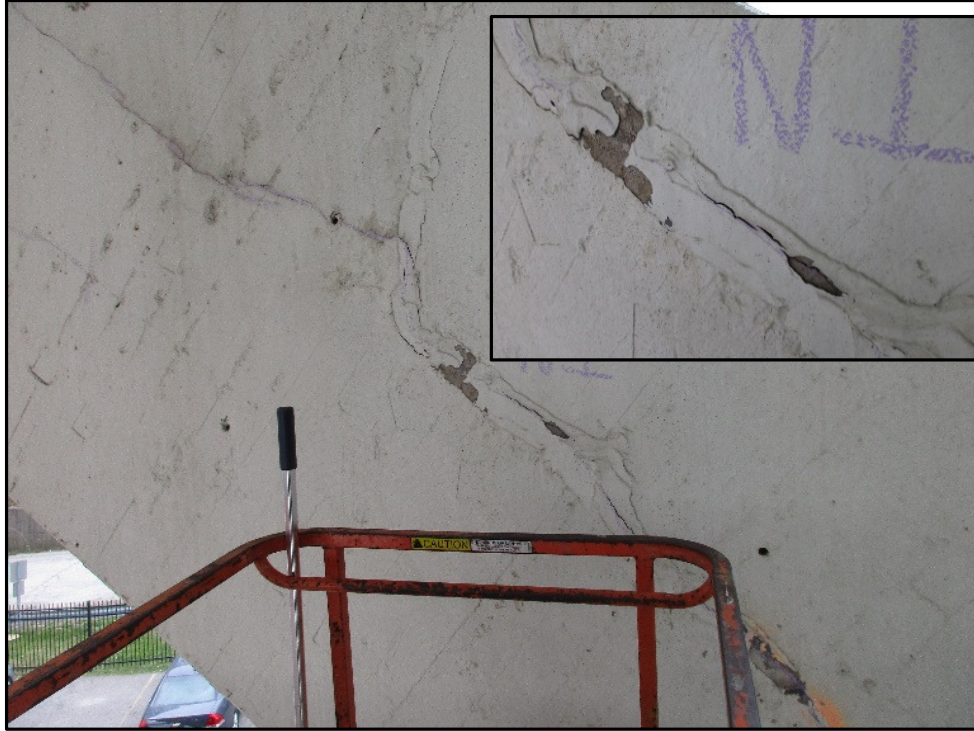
New Crack at Previous Epoxy Injection Repair, NI Arch Rib, Span 3.
